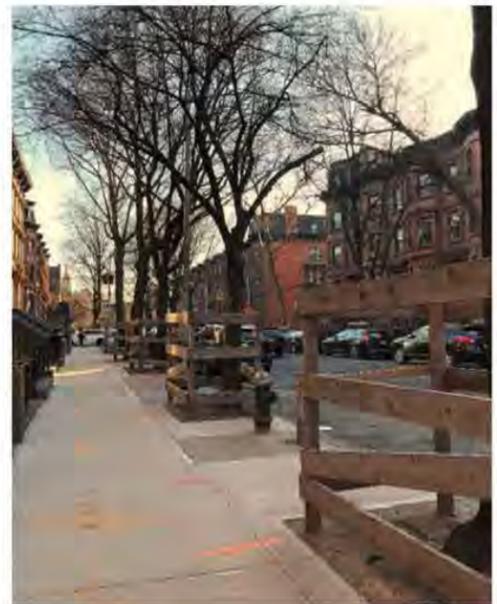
TREE PROTECTION FENCE EXAMPLE (via City of Berkeley - SEE DETAIL TP2 FOR NOTES)
